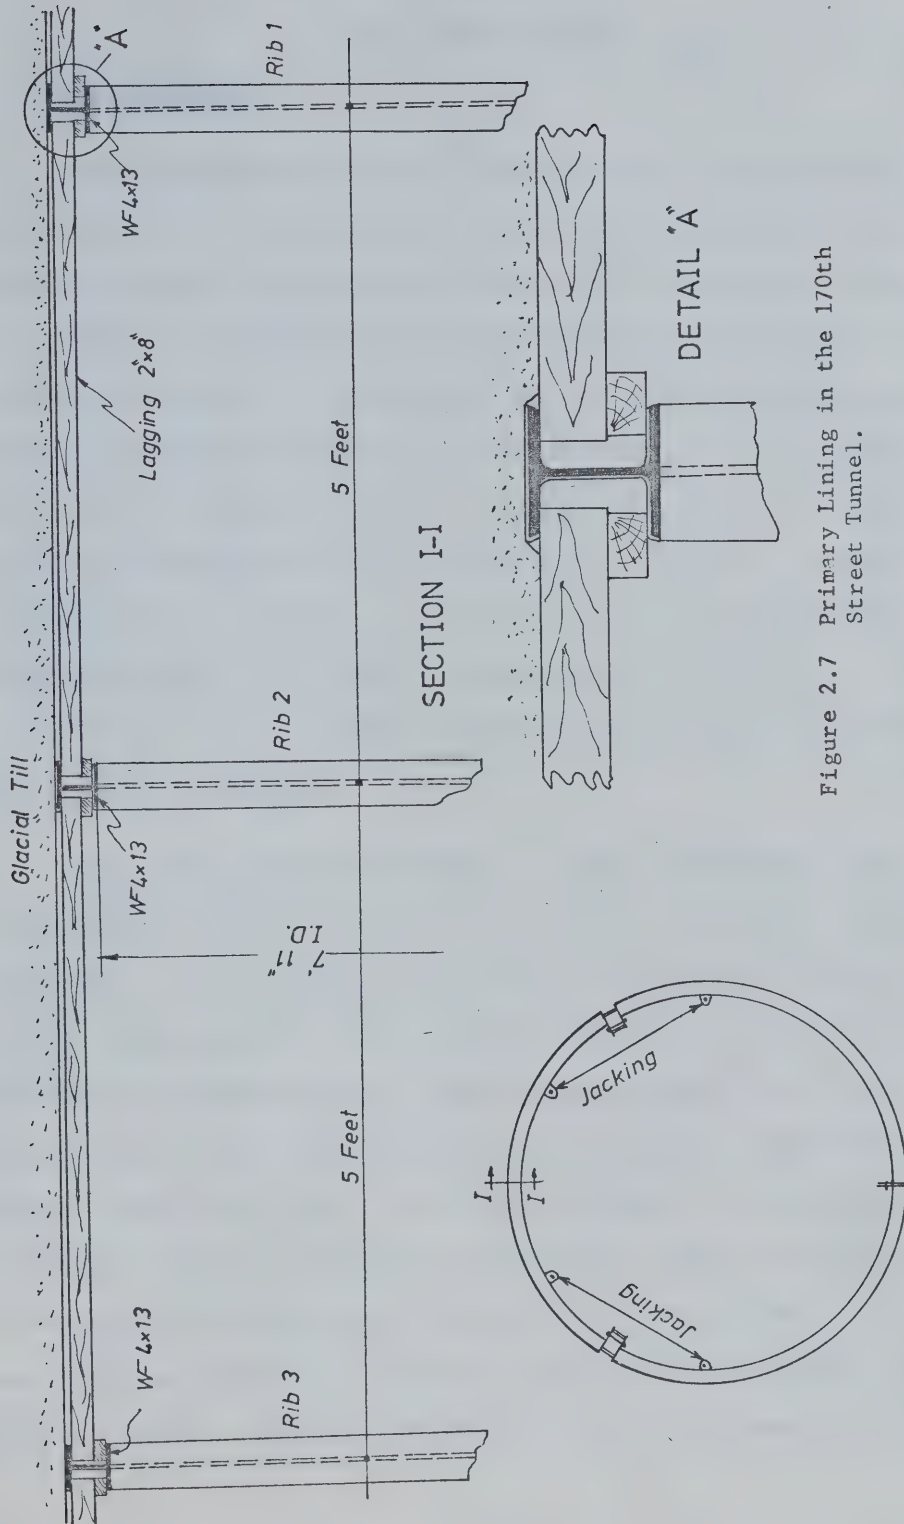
Primary Lining in the 170th Street Tunnel.
